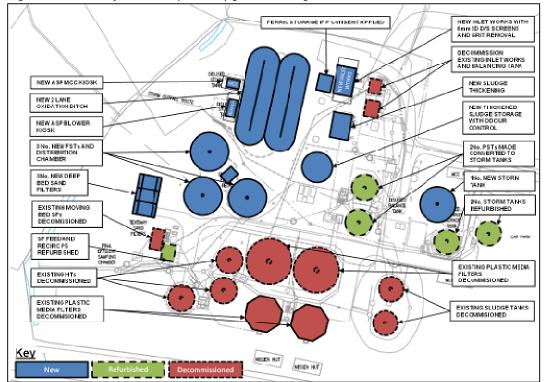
Site Layout for Proposed Upgrade to Tangmere WwTW
